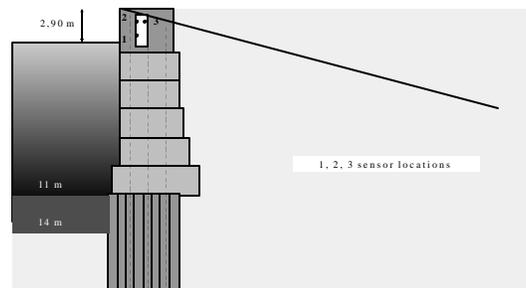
Quay wall cross-section, strengthening works and sensor locations.
